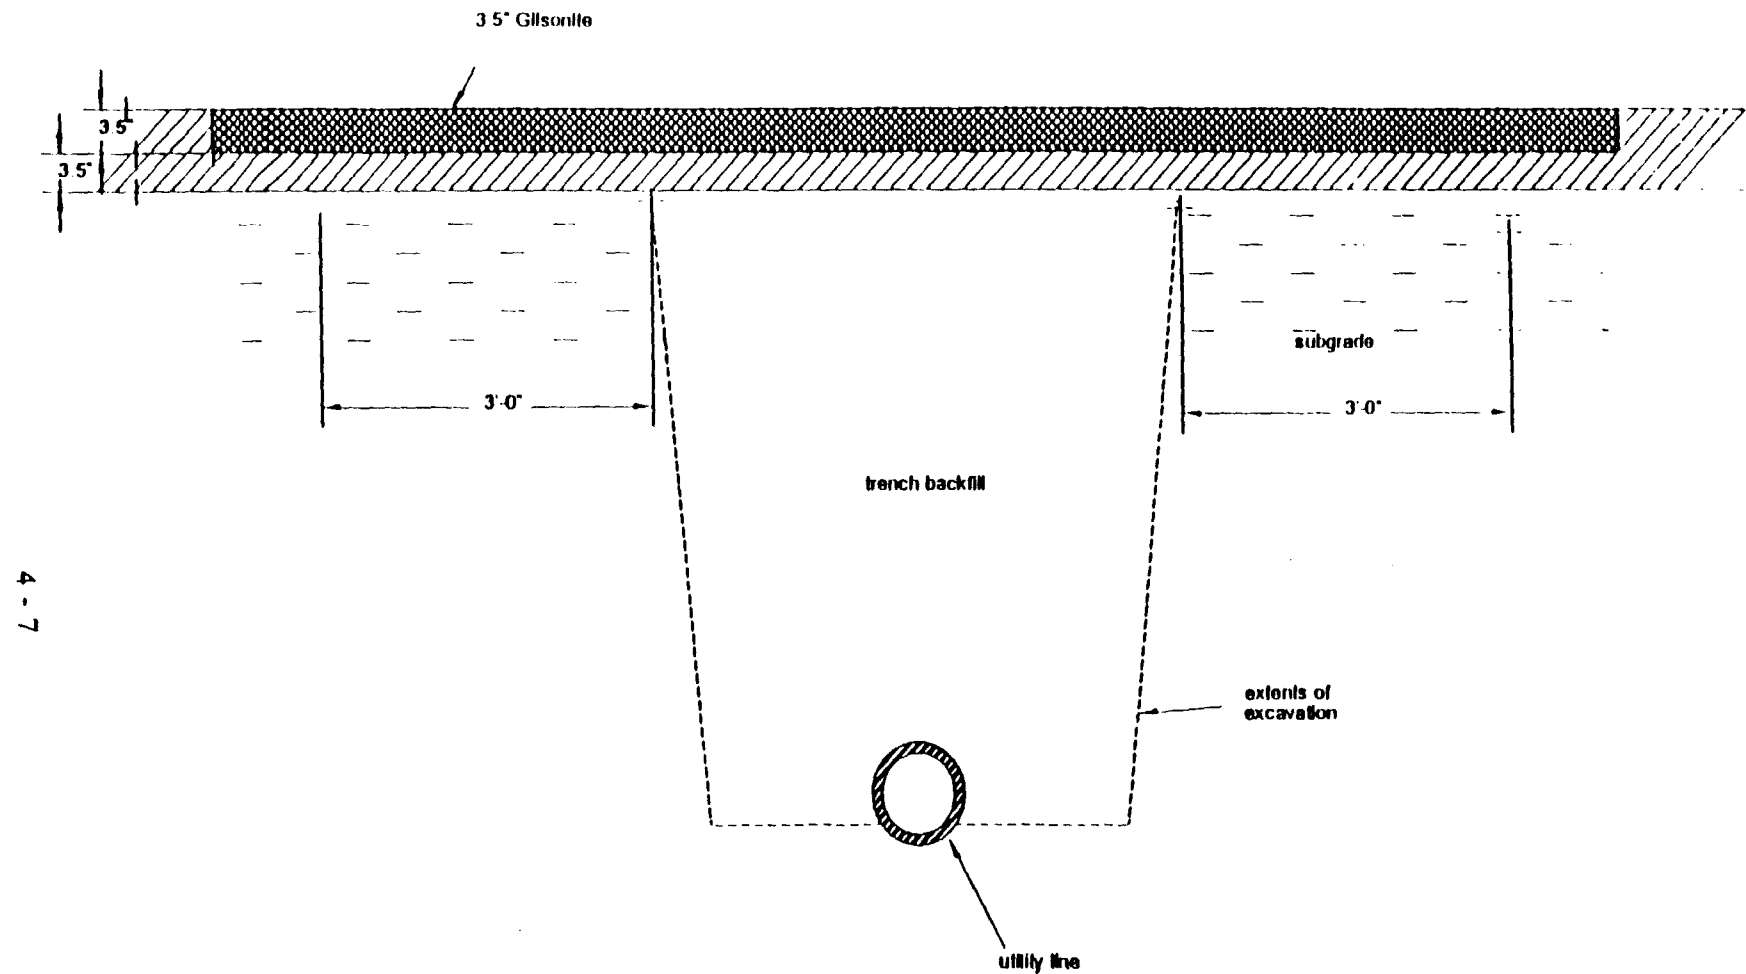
Pavement Strengthening by Replacing a 3.5 in. Thick Portion of AC Pavement with 3.5 in. Thick Gilsonite Asphalt Pad - Scheme 2
